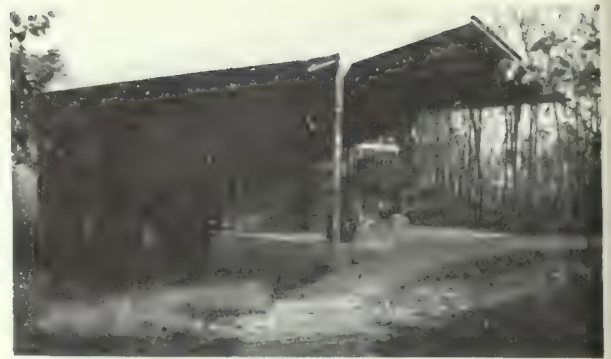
A rigid-frame cabin made from hardwood lumber.
